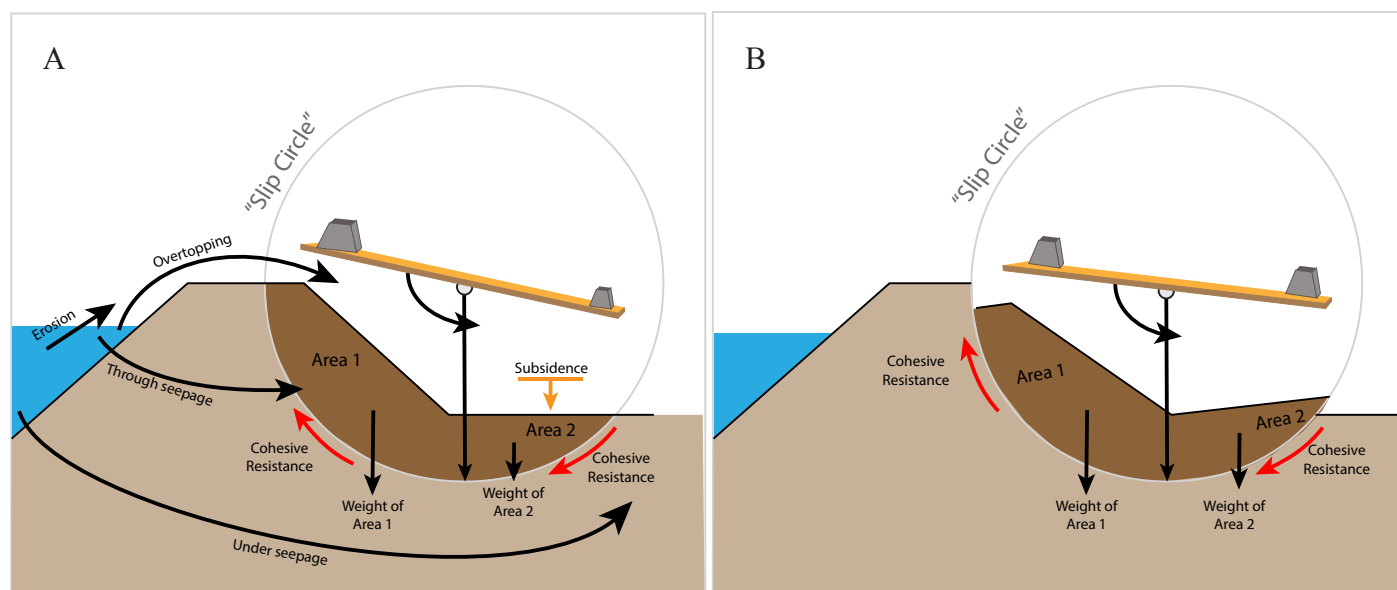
Levee modes of failure. Levees fail when external forces upset the levee internal cohesive forces holding the embankment in place against forces that would cause it to move towards equilibrium (like a teeter-totter) (A, B). Through seepage reduces levee cohesive forces. Under-seepage can erode levee foundation materials and also upset the ability of cohesive forces to keep the embankment in place.
